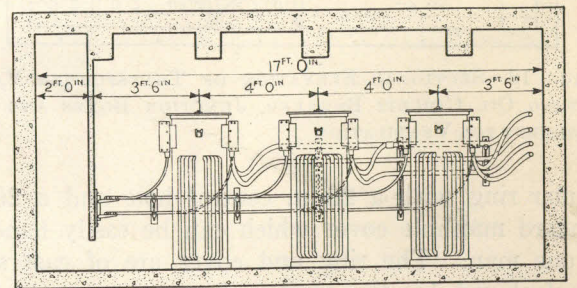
SECTIONAL ELEVATION OF TRANSFORMER VAULT SHOWING ARRANGEMENT OF TRANSFORMERS
